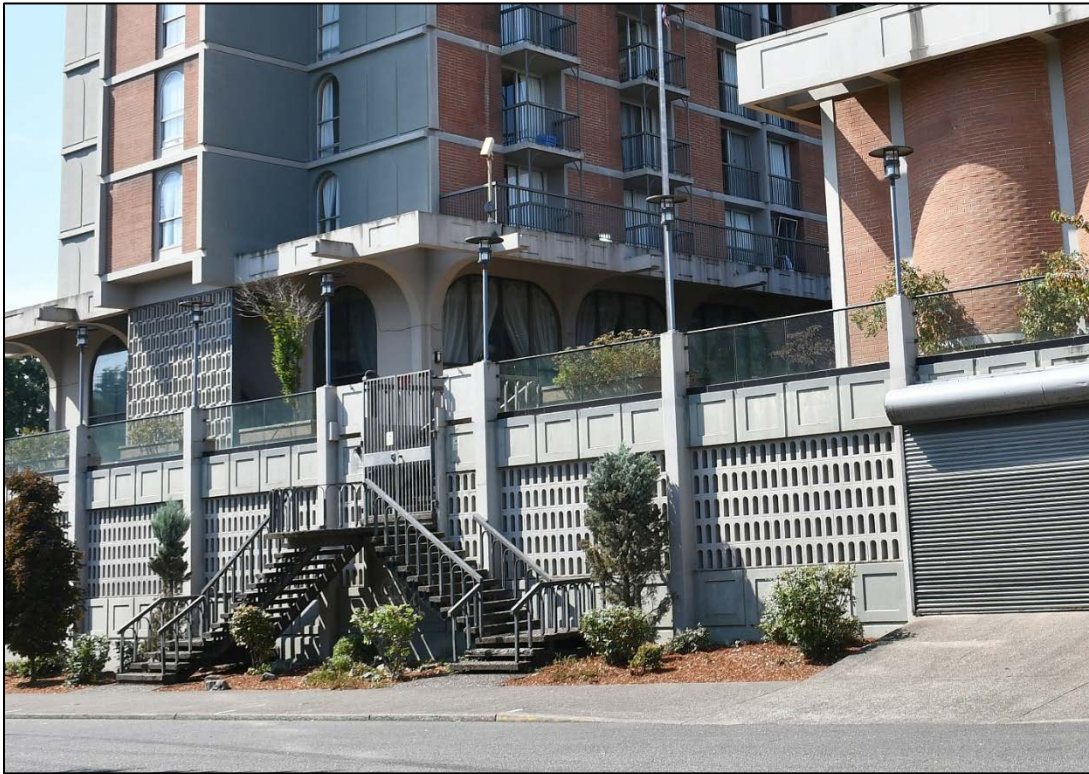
of 25: Terrace stairs on south elevation, camera facing southwest
